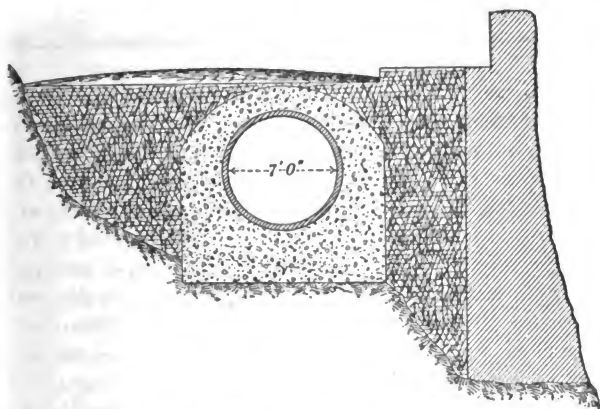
Sea-wall, Sewer, and Road, at Meadfoot Beach.
